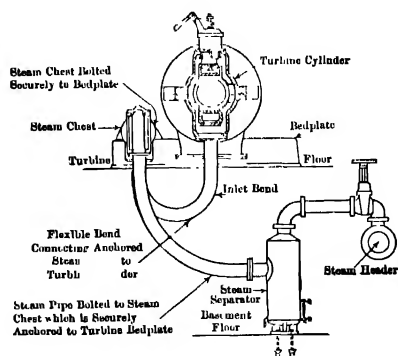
Separator Applied to a Steam Turbine — Basement Header.
